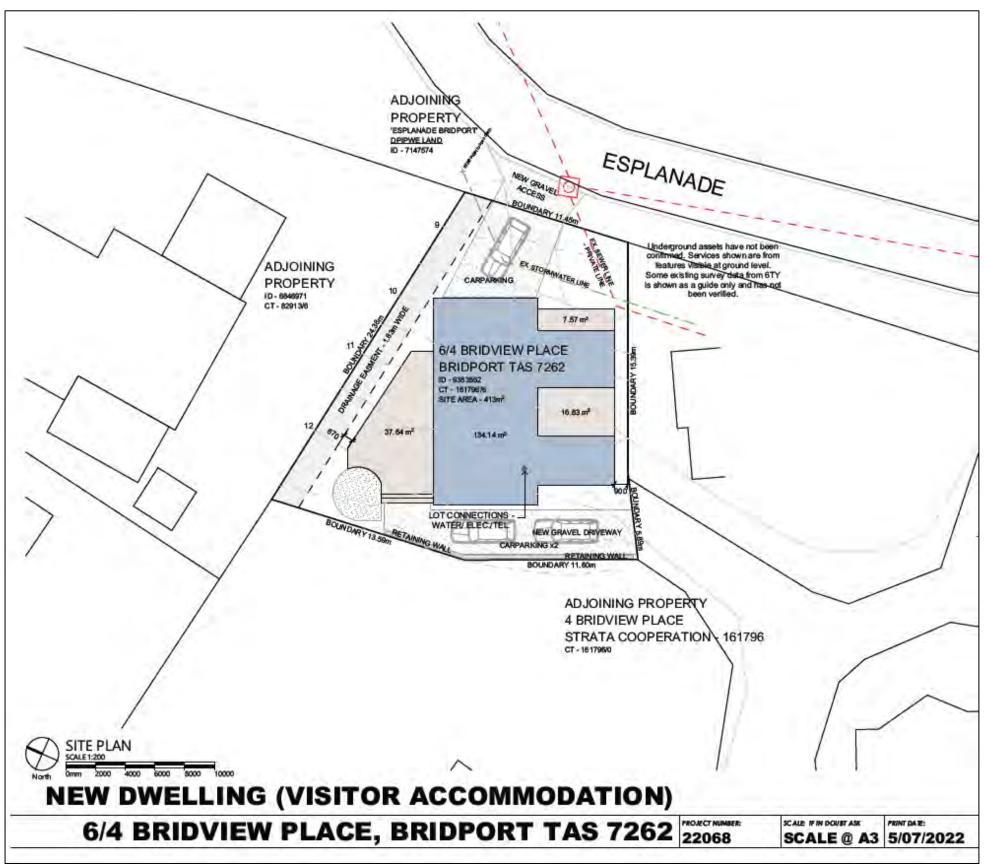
Site plan of proposed visitor accommodation unit (source Plans to Build 2022)
